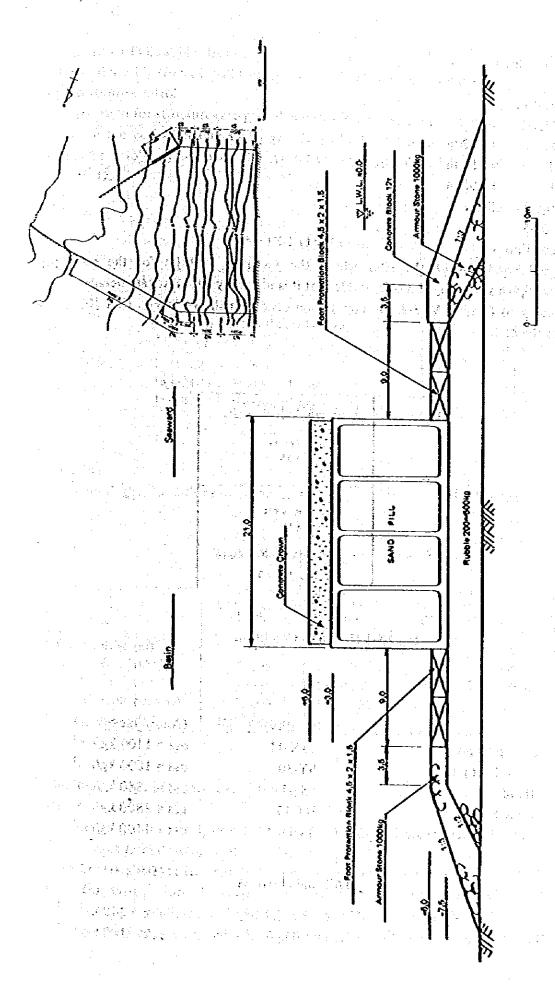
(9) Standard Crosssection of Breakwater (S4 Section)
